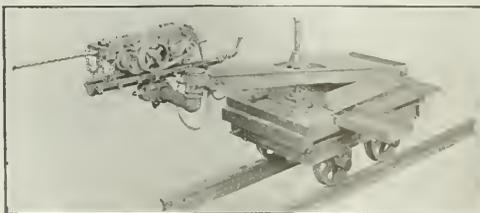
DRILL MOUNTED ON BOOM OF MINE TRUCK
